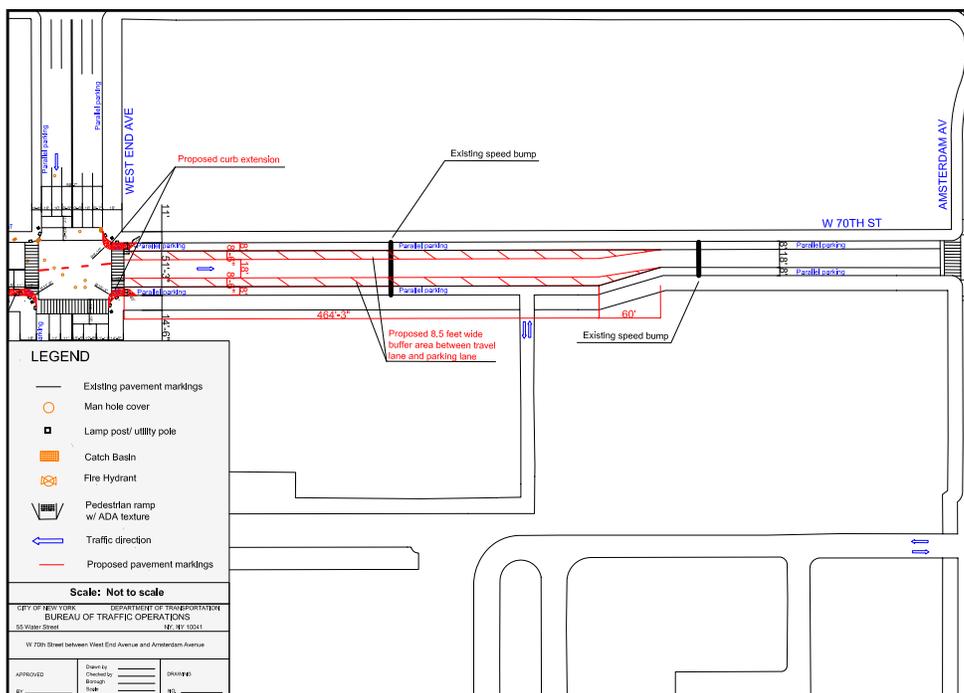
Proposed conditions on West 70th Street between Amsterdam Avenue and West End Avenue
